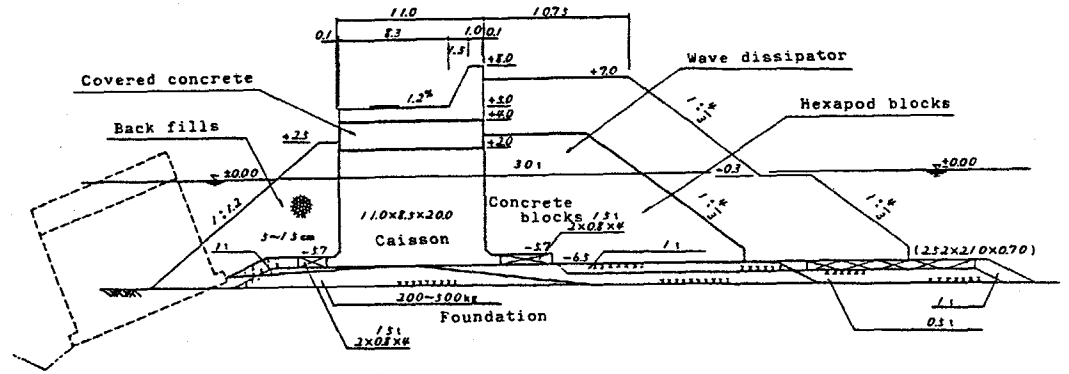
Cross Section of the Revetment with an Example of Dislocated Caissons.
